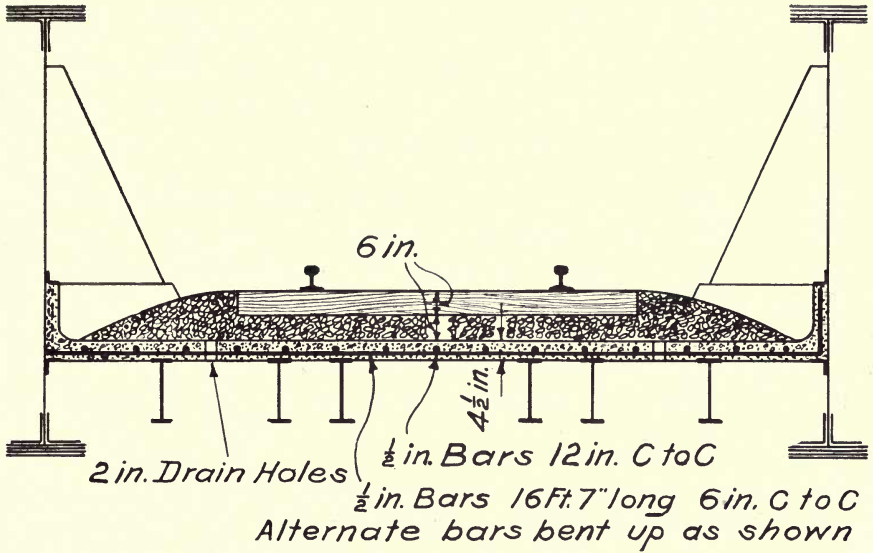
CROSS SECTION, THROUGH-GIRDER BRIDGE FLOOR, C., B. & Q. R. R.
